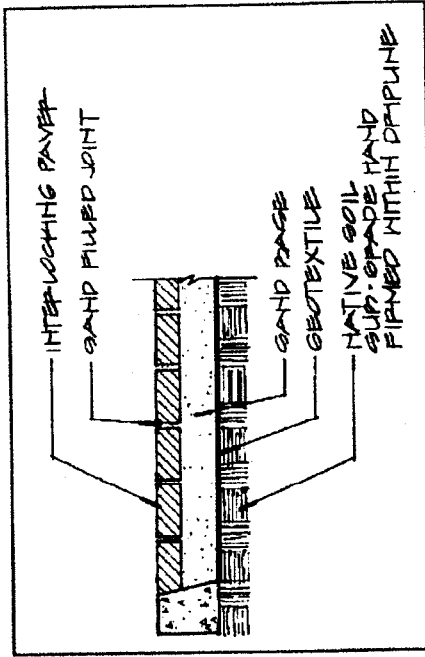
Brick or interlocking pavers on sand often are recommended as pervious paving. Use of geotextile under the sand and hand-firmed subgrade can minimize root impacts.
